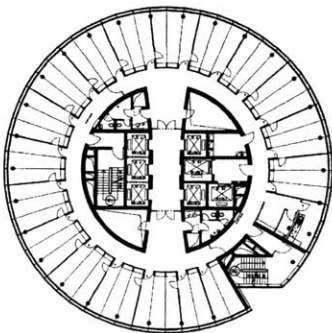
Sample floor plan. All offices have windows to the exterior. The interior core houses elevators, storage rooms, and mechanical plant equipment.
